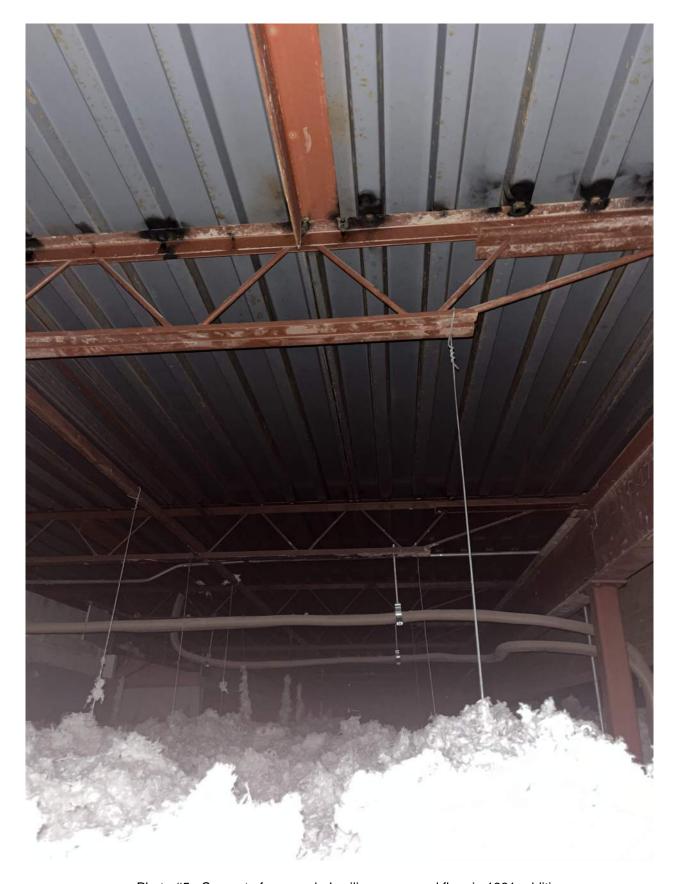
Support of suspended ceiling on second floor in 1991 addition
